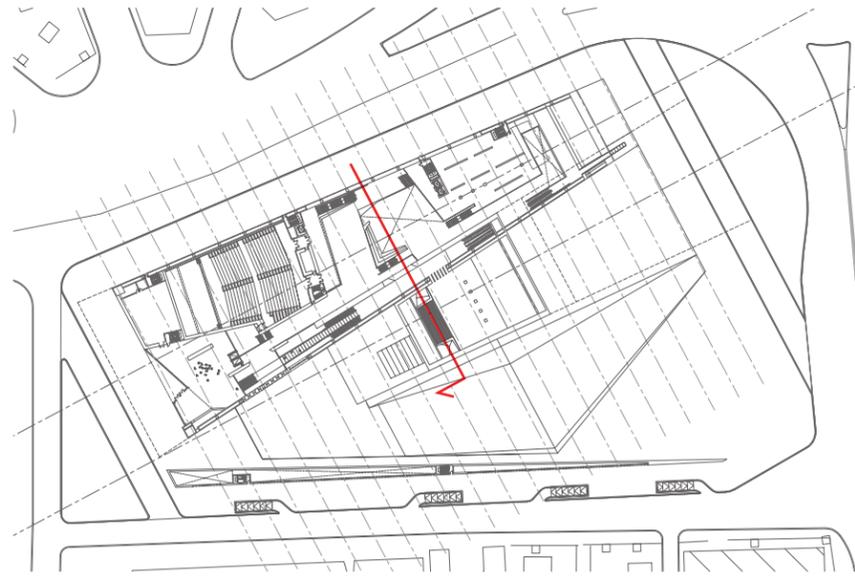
| Cross Section Drawing (The Stair to the Mezzanine Level)
